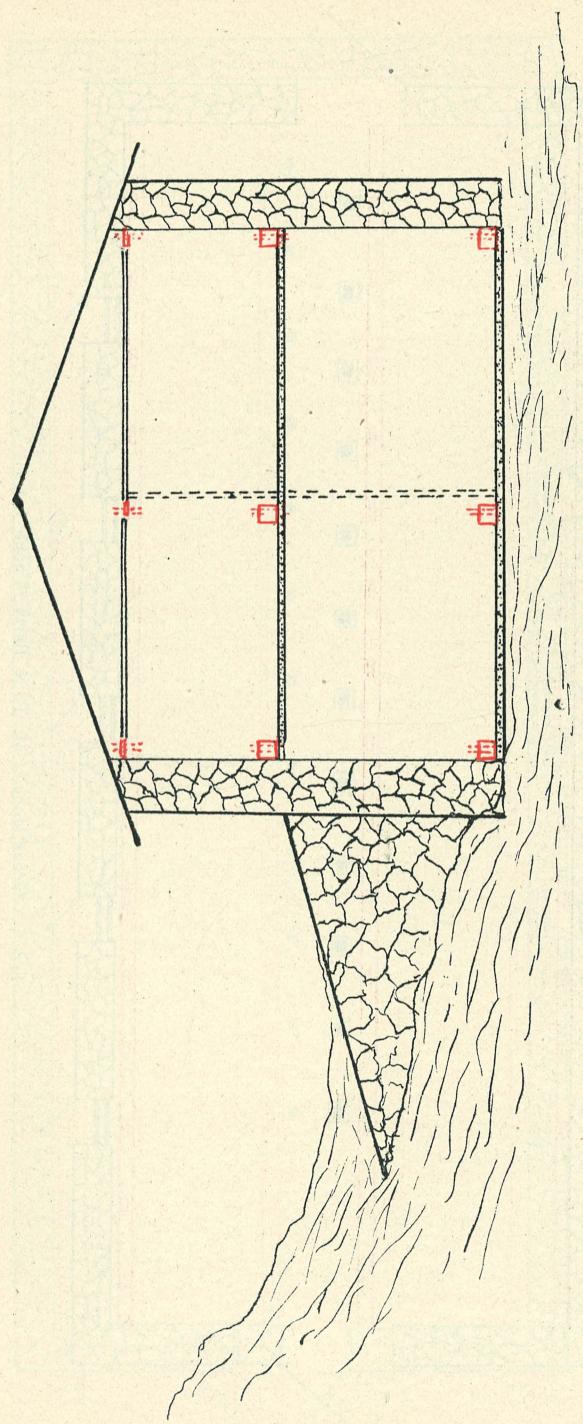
Cross-section of Mr. R. N. Barber's apple house.
